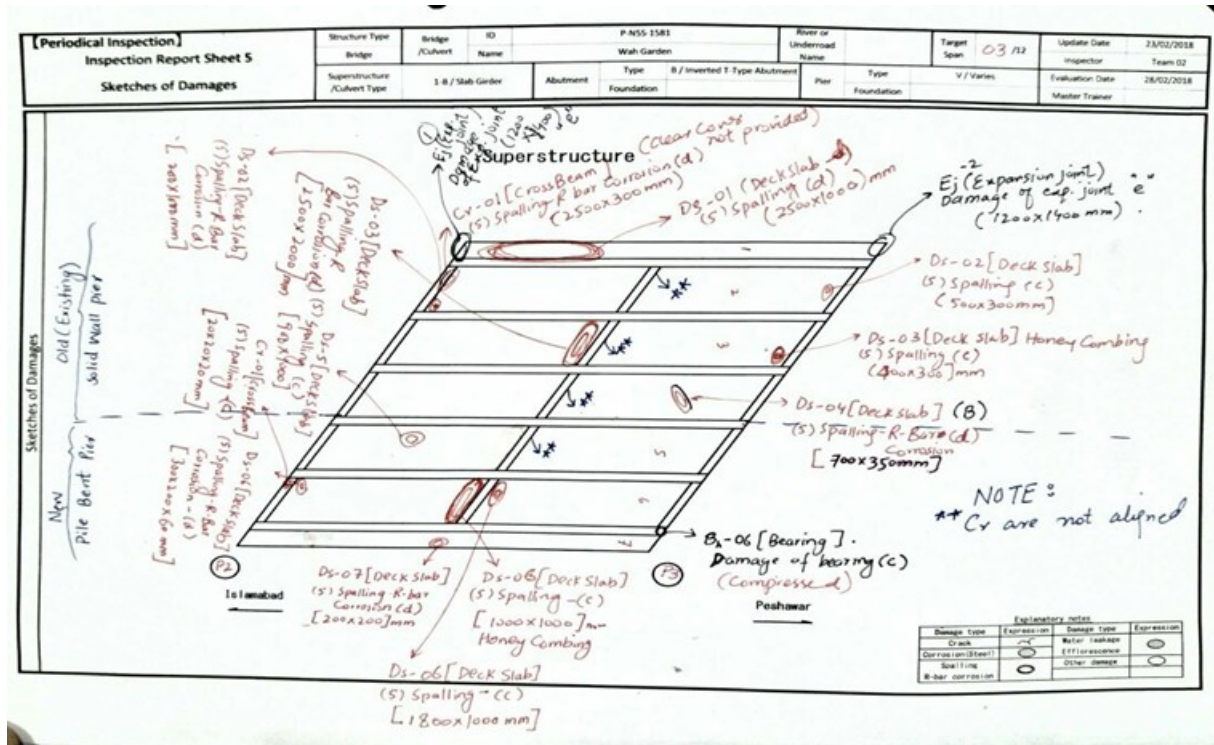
Bridge Inspection Sheet (Team 1)
